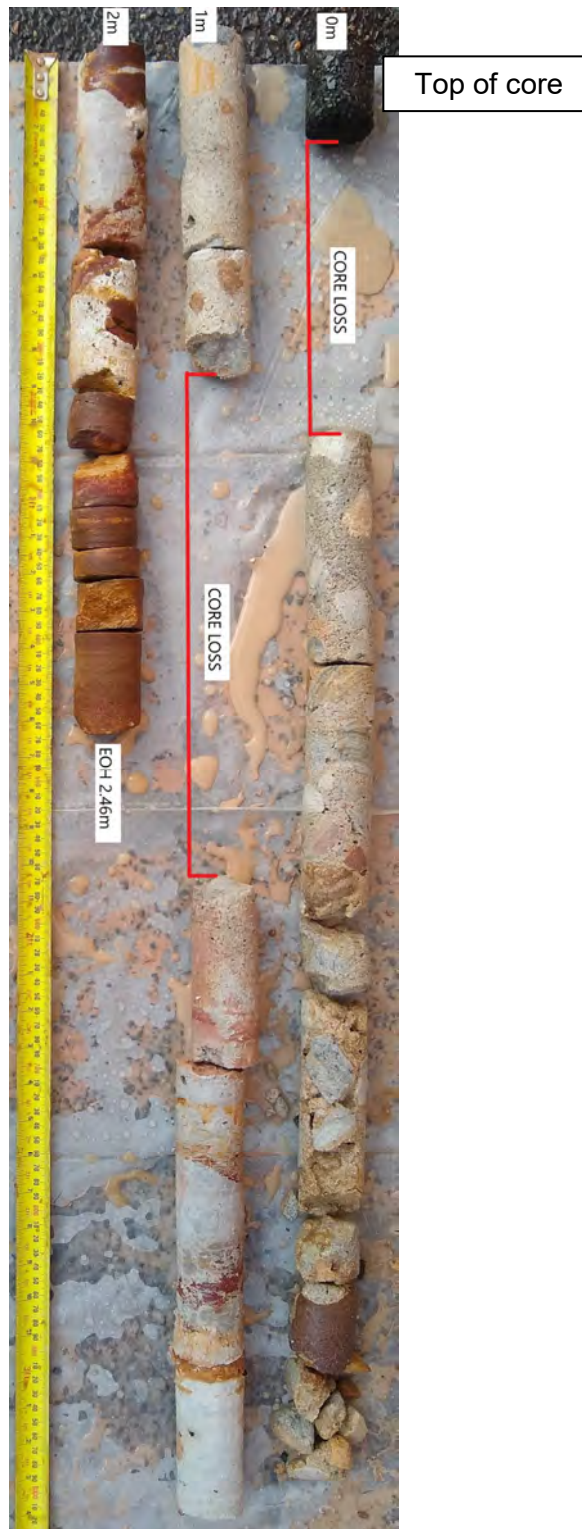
View of core obtained from Borehole W1. Core losses were encountered above and below the retaining wall concrete footing.
